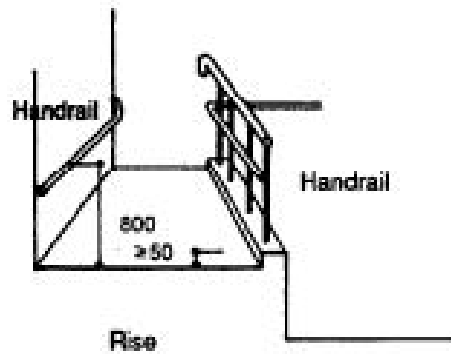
Corridor connecting the Entrance/exit for the handicapped
